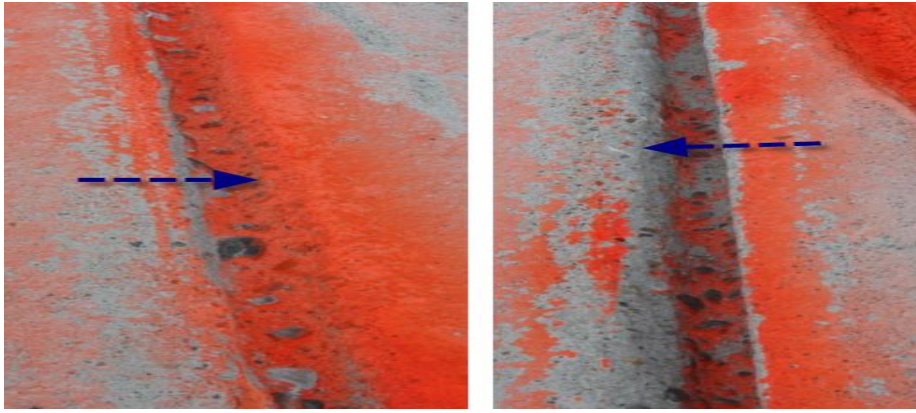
Crack wall prior to testing (left) and crack wall after testing (right).
